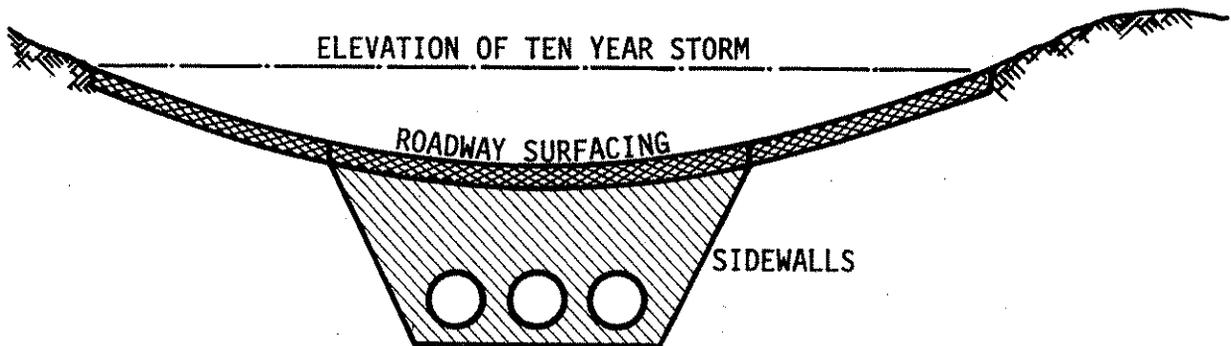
Minimum limits of LWSC roadway surfacing.
